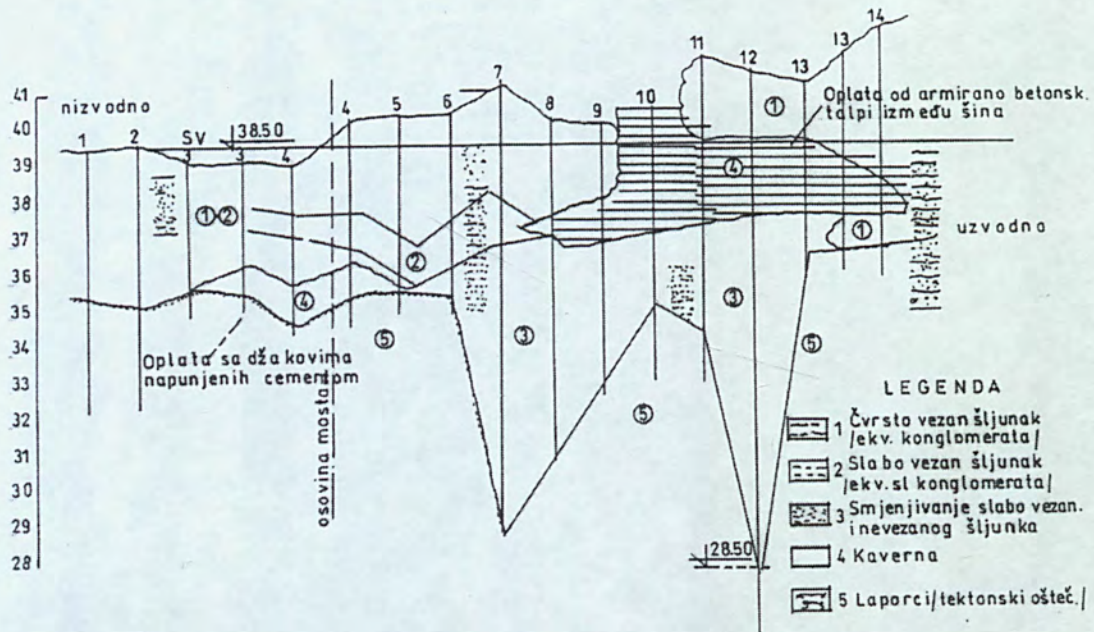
Longitudinal section of performed grouting works on the right river-side
